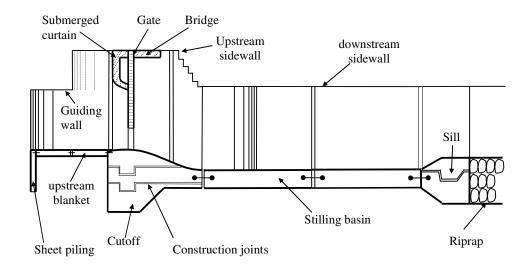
Longitudinal profile of a typical sluiceway and stilling basin.
